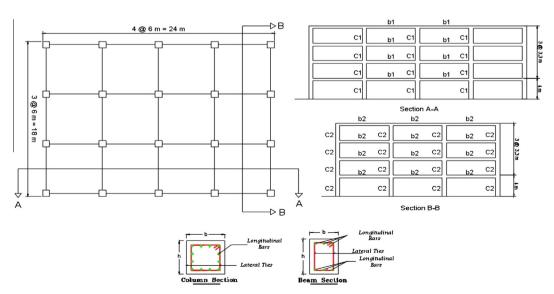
Plan, elevation and details of the columns and beams of the 4-story archetypes.
